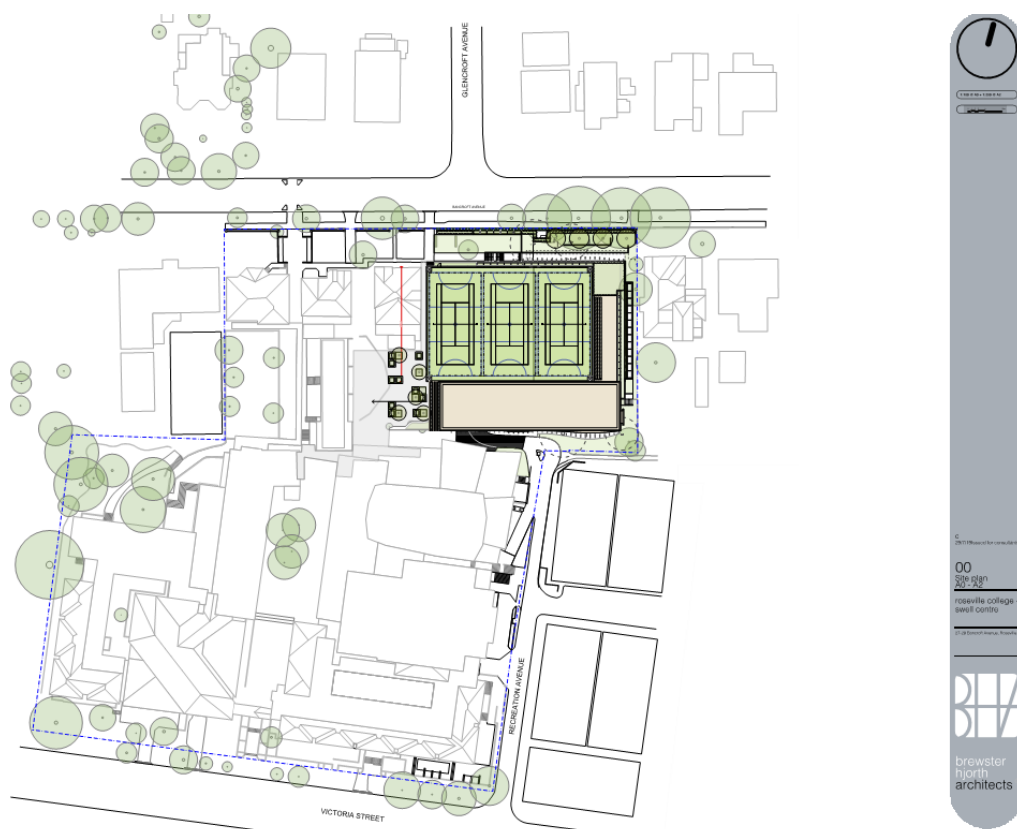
Proposed SWELL Centre Architectural Site Plan. Source: Brewster Hjorth Architects
